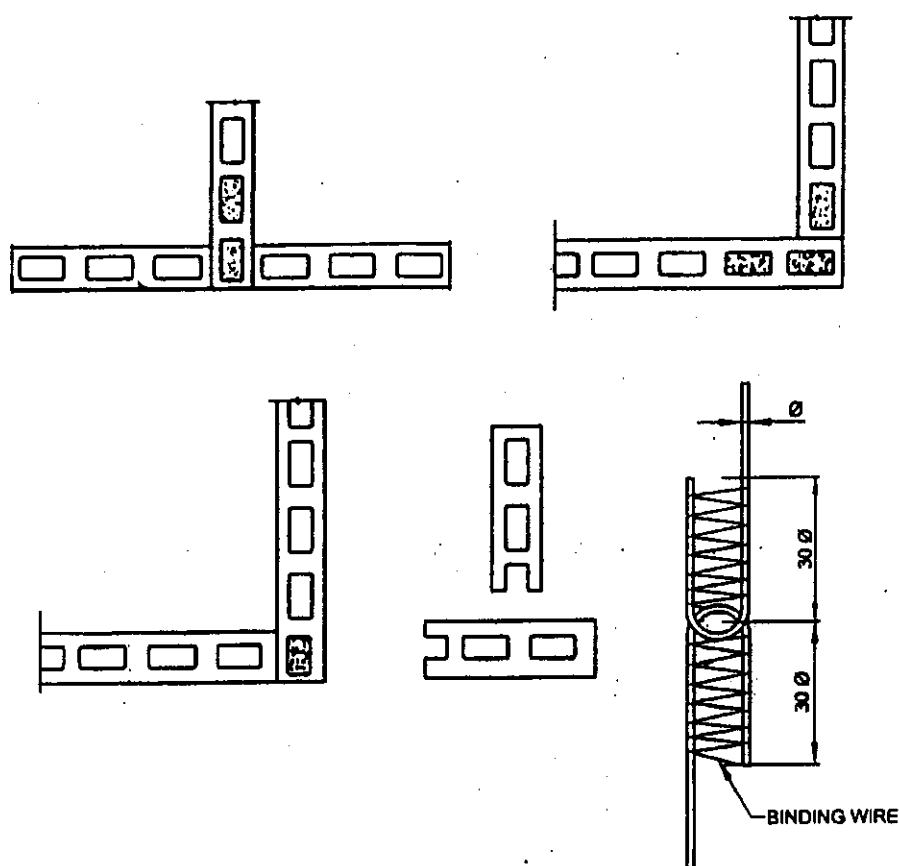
VERTICAL REINFORCEMENT IN CAVITIES
